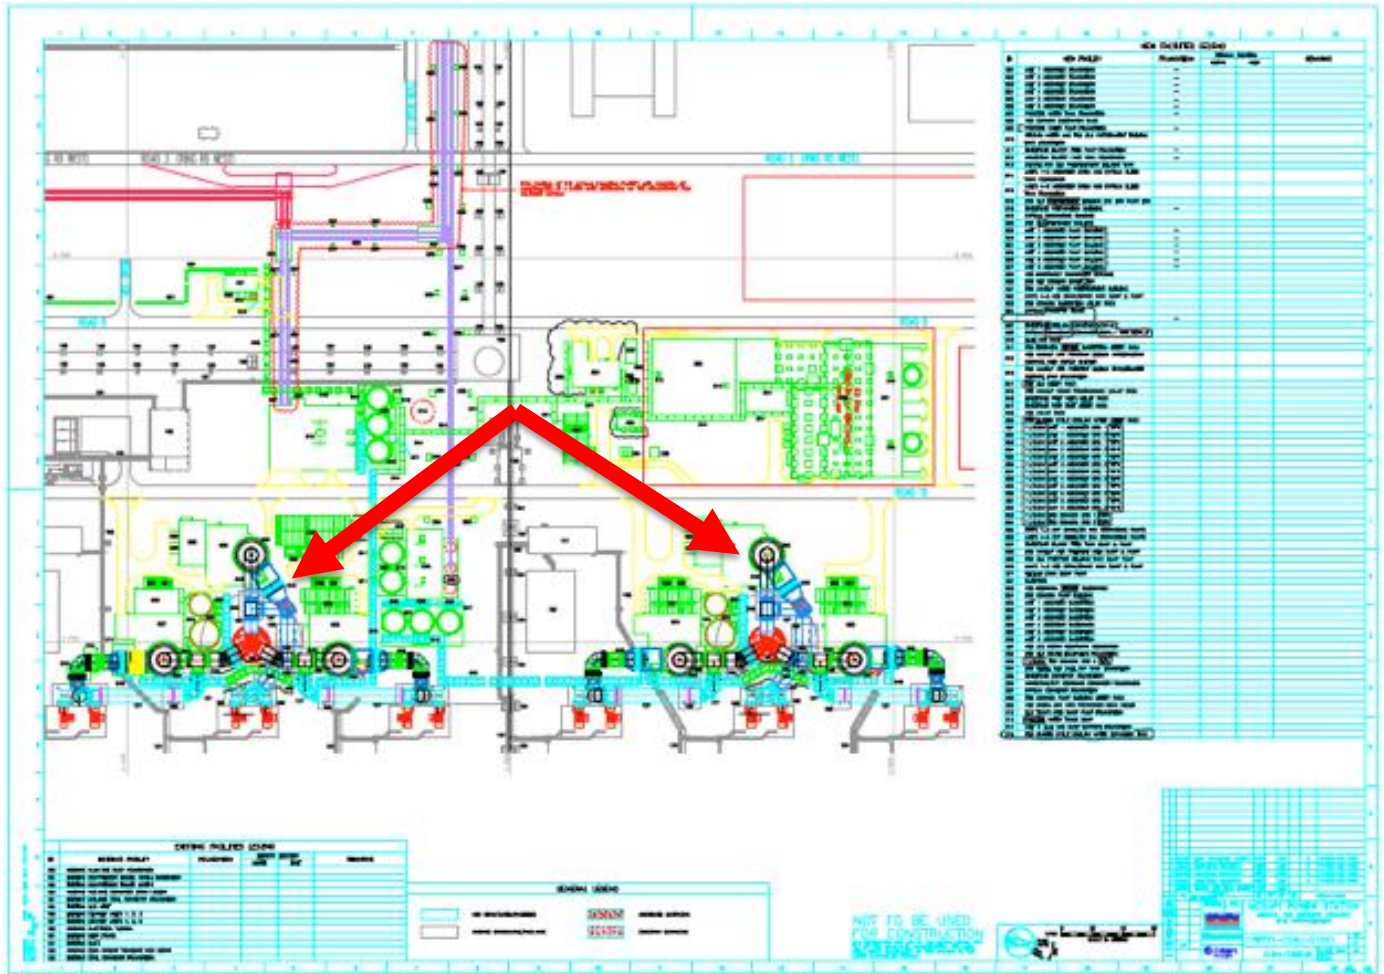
Location of the proposed FGD technology construction sites (red arrows)
